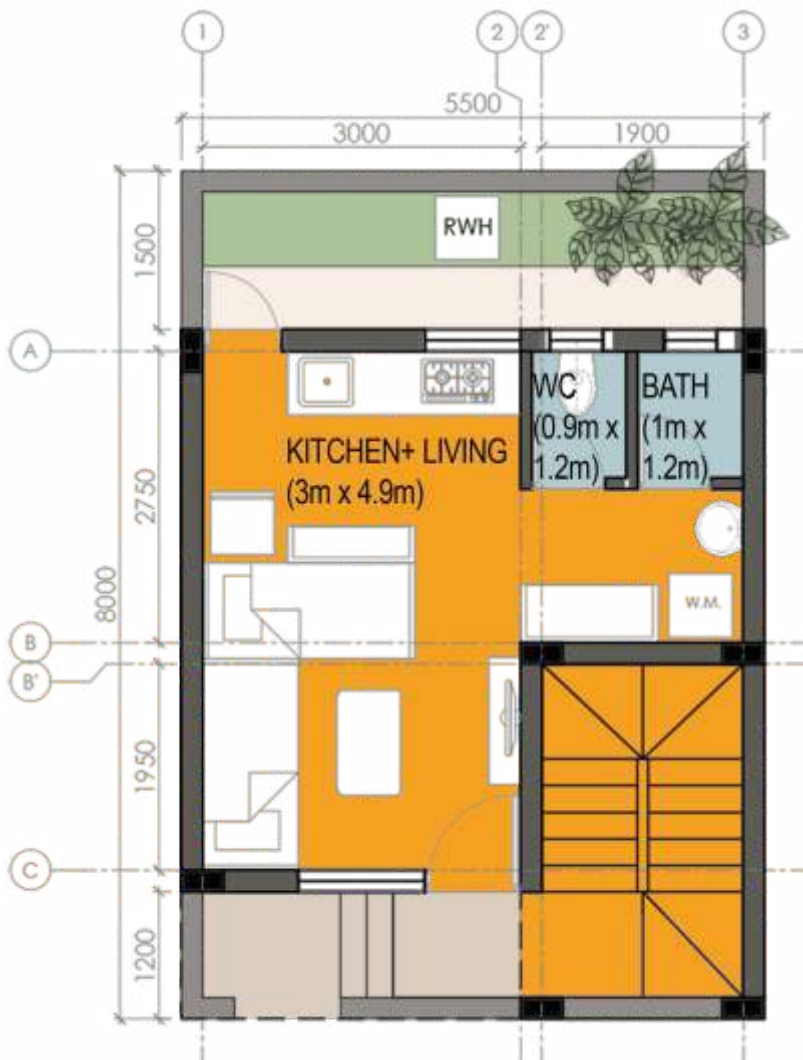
Typical ground floor plan of Type 1A dwelling unit
